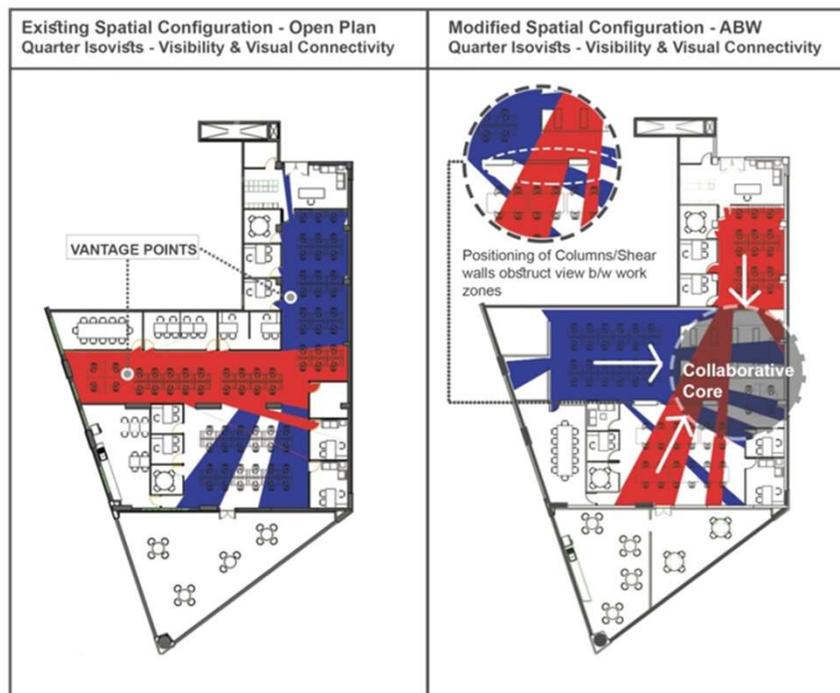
(a) Isovists: Open-plan layout – Existing (b) Isovists: ABW planning- Proposed; Source: Author
